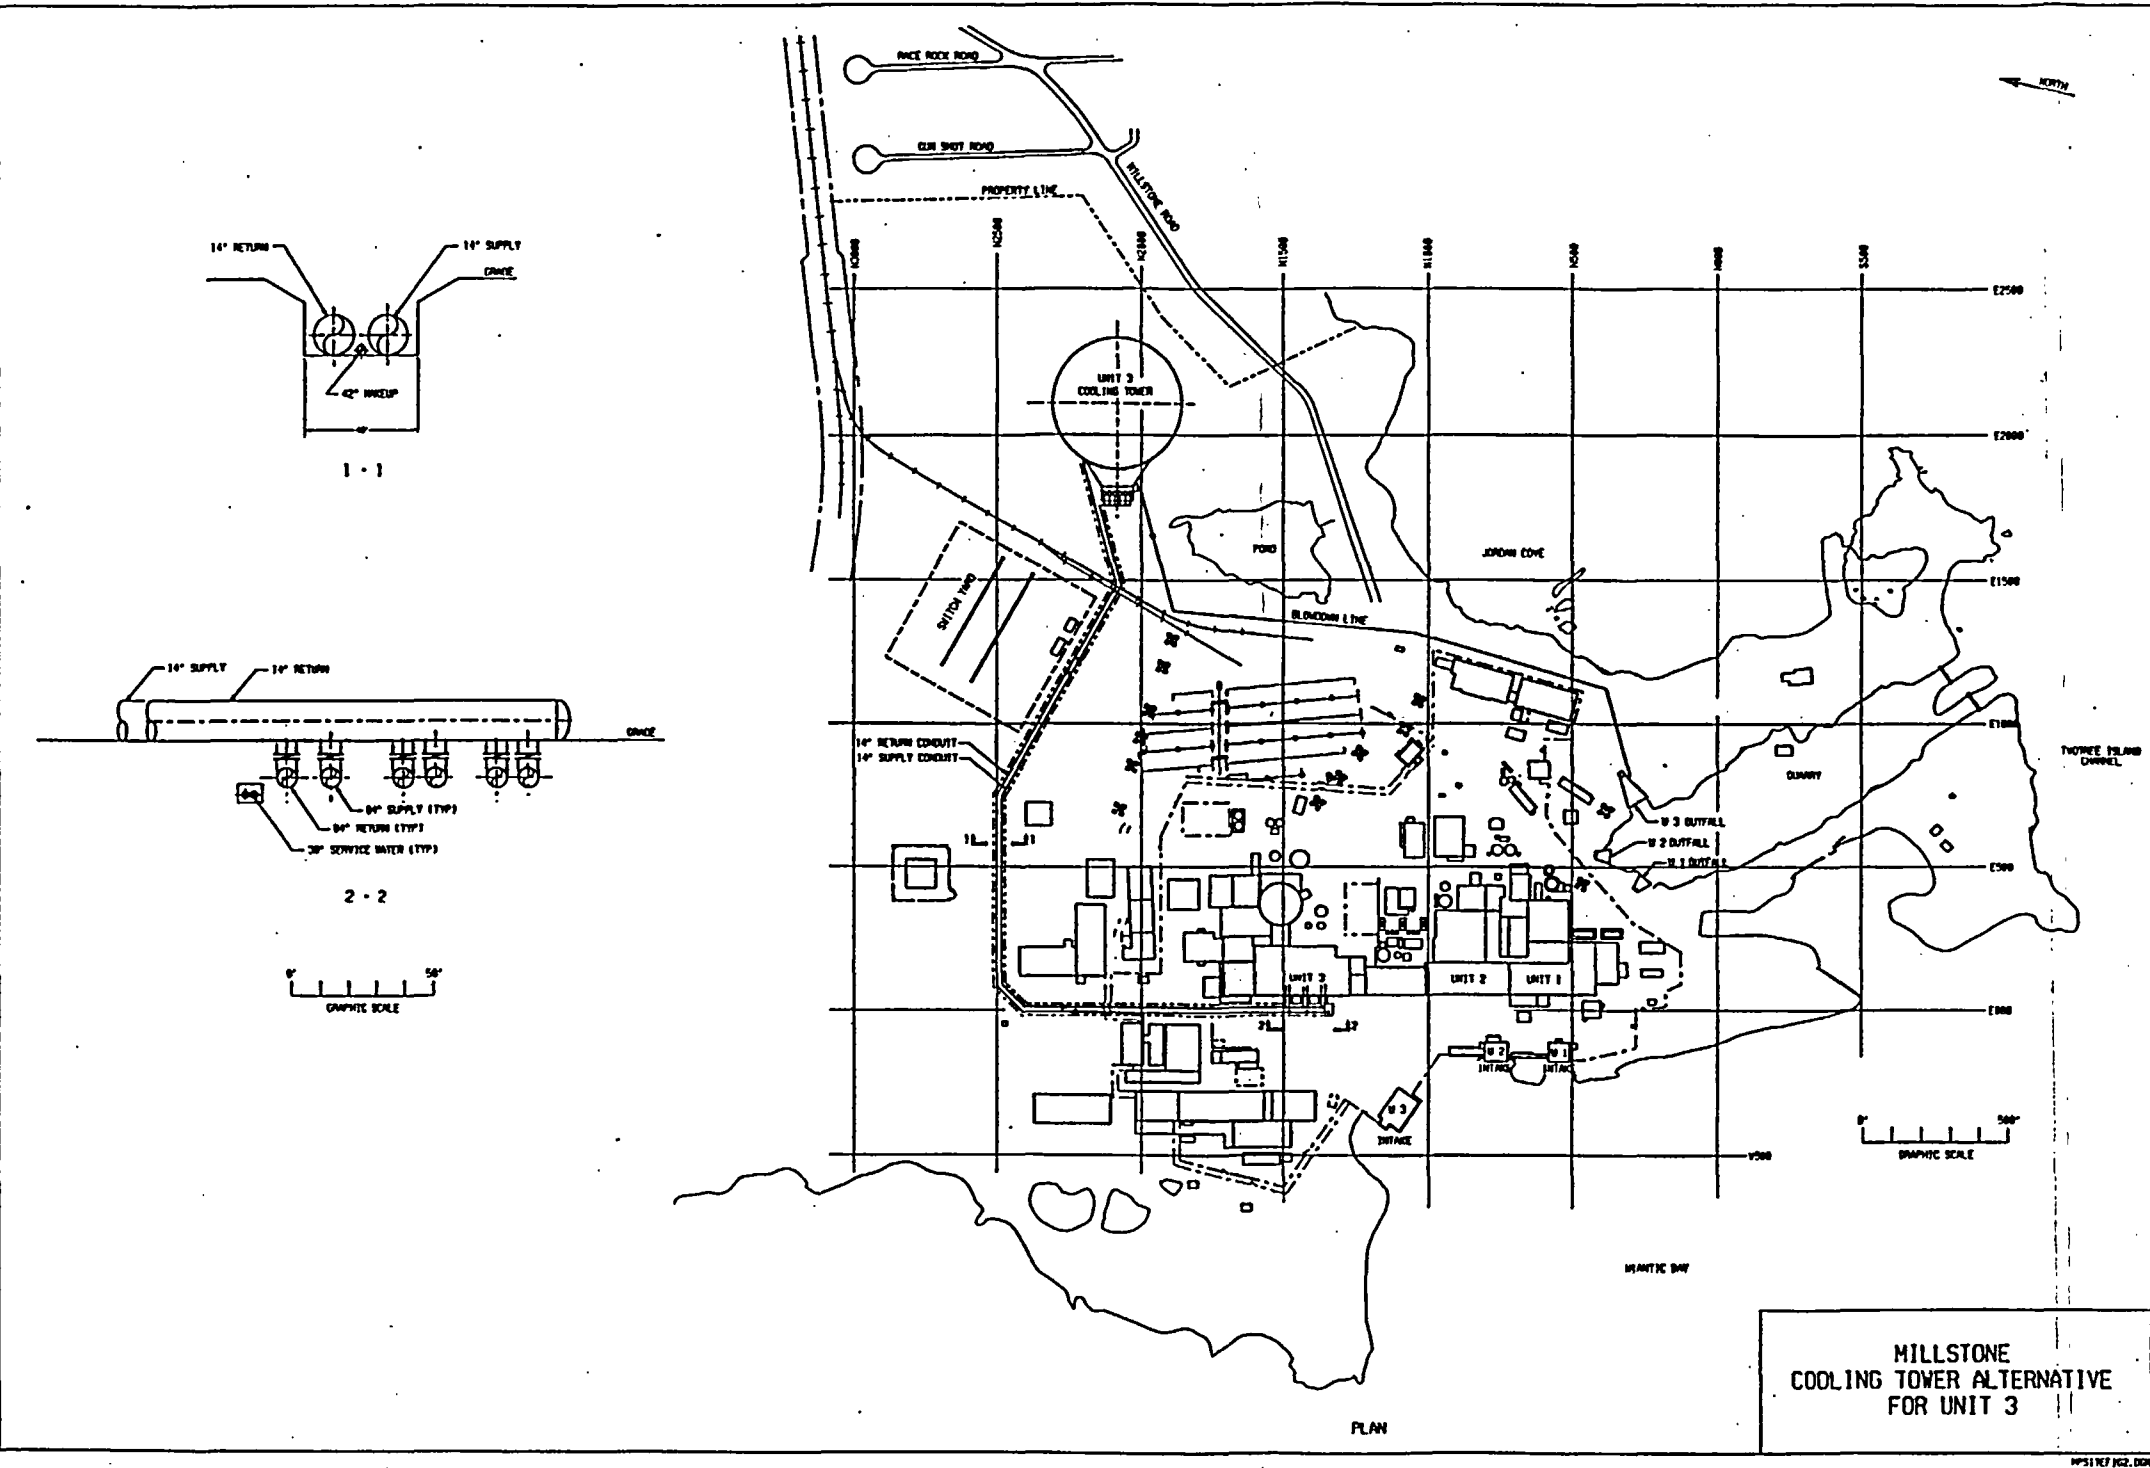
Unit 3 - Natural-Draft Cooling Tower Arrangement (Full Size)
